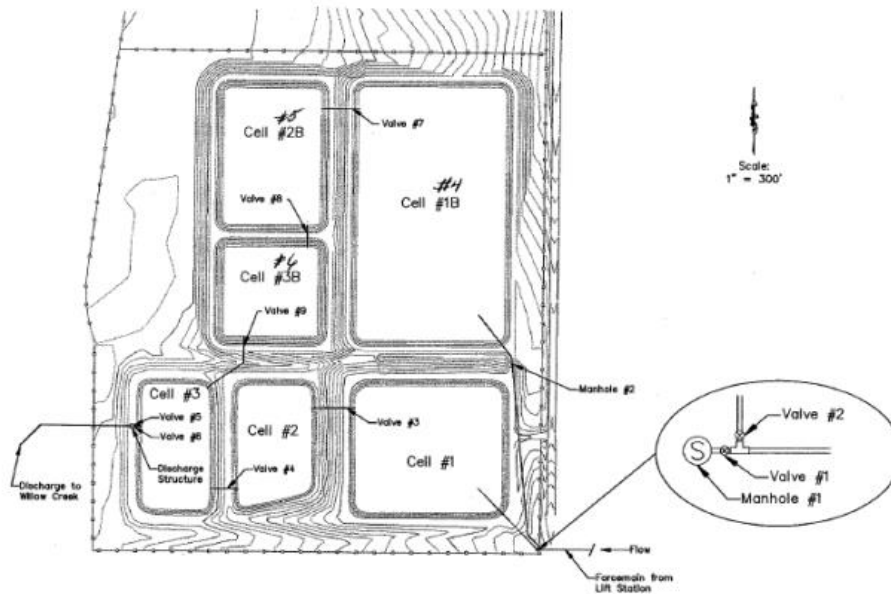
City of Crooks Wastewater Treatment Facility’s Diagram
